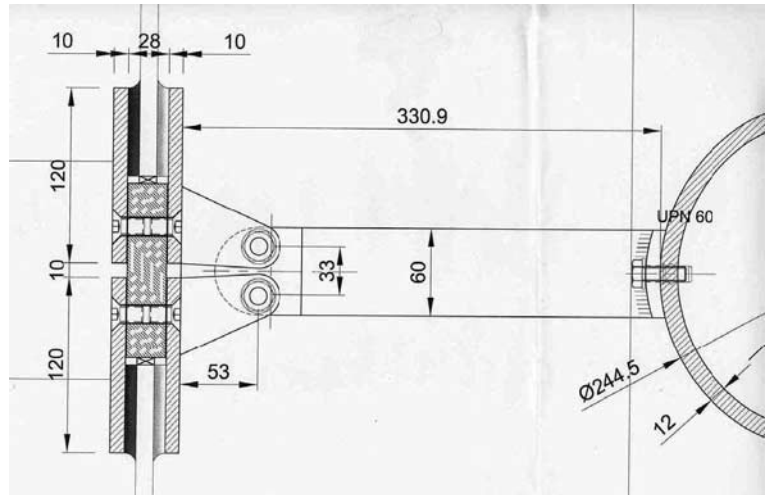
The horizontal, intermediate connecting detail of the 11 meter high corrugated glass façade of the MAS.
